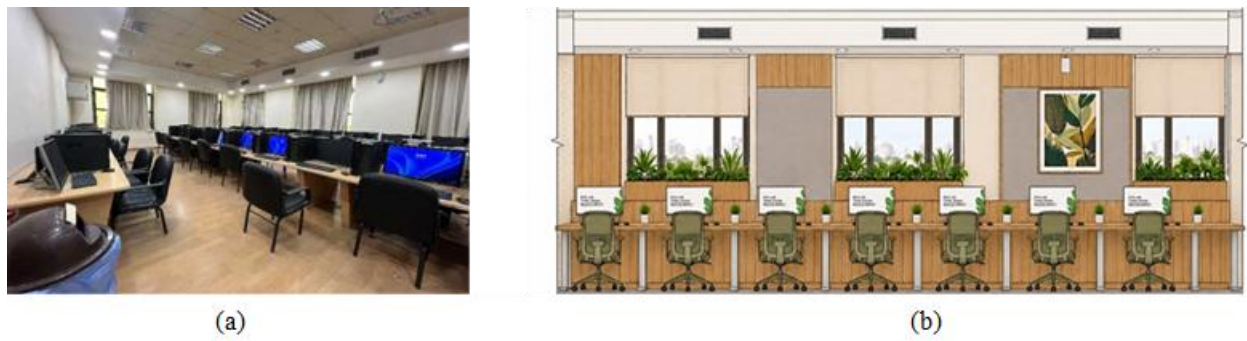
Computer laboratory: (a) existing condition; (b) schematic rendered wall elevation of the proposed treatment (not to scale) showing roller-blind-fitted glazing, wood cladding with planting integration, and workstation organisation.
